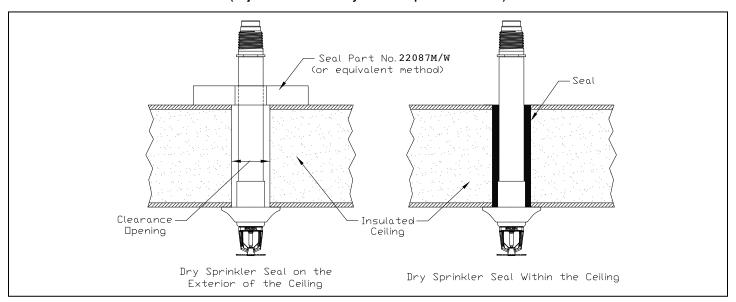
Dry Sprinkler Seal (Adjustable Standard Dry Pendent Sprinkler is Shown)
